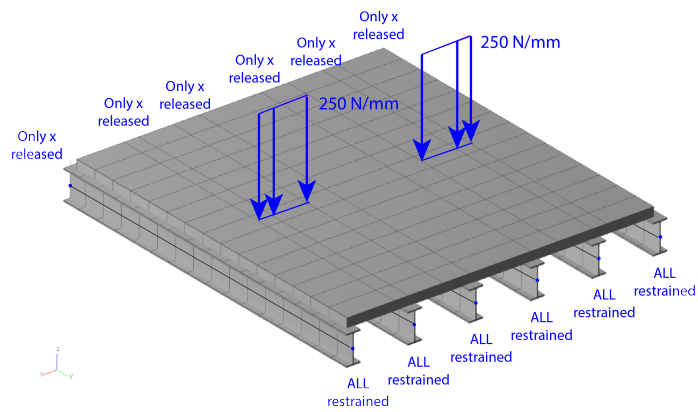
Loaded situation of one deck field with clamped connections to the cross girders
